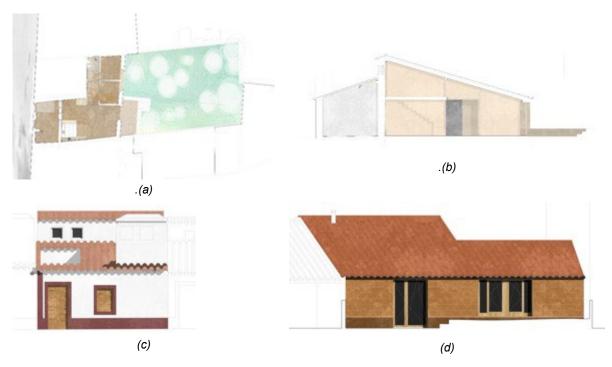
(a) Ground floor plan, (b) section (c) East facade and (d) West façade of the Ruinha House
